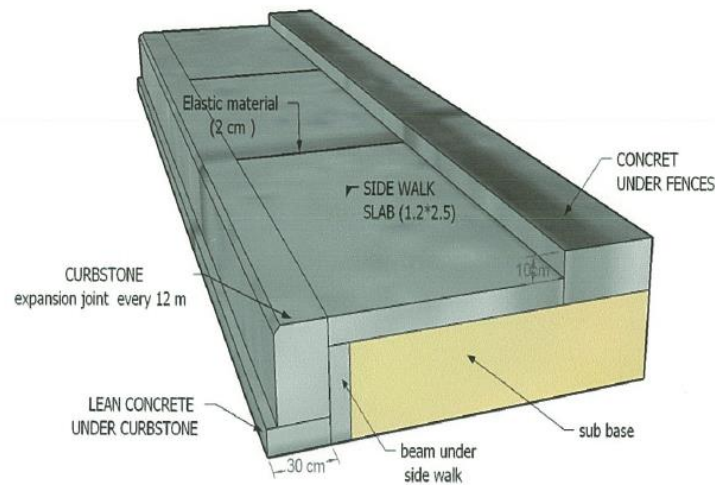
New sidewalk between the bridges Souk Athulatha1 and 2
